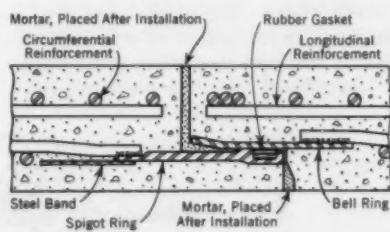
Noncylinder Nonprestressed-Concrete Pipe and Joint
